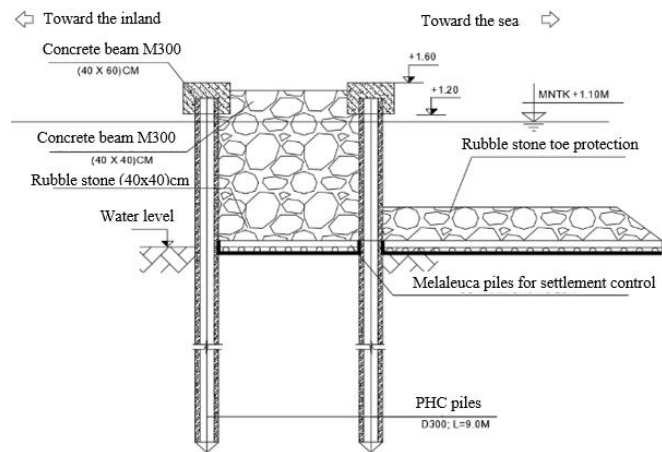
Proposed breakwater structure for An Bien - An Minh area.
